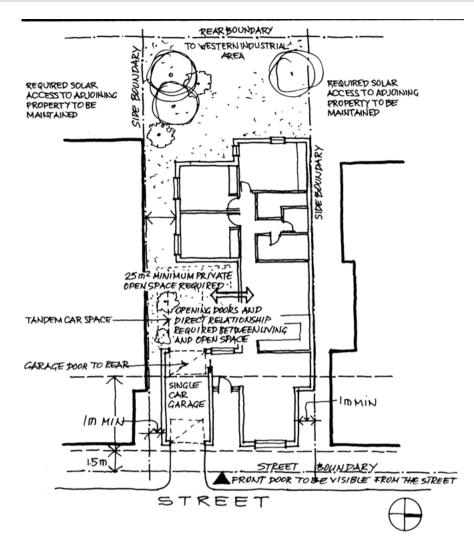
Single storey courtyard dwelling layout.
